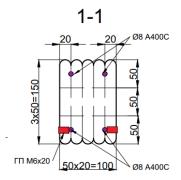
Reinforced beam made by 3D printing with single bars reinforcement
